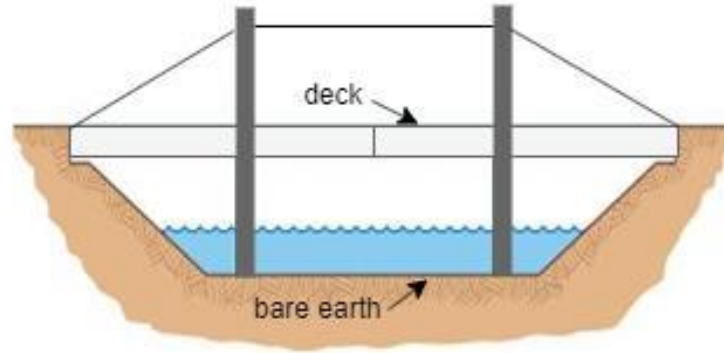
Cross section of a waterway bridge (Alabbad et al., 2021)
